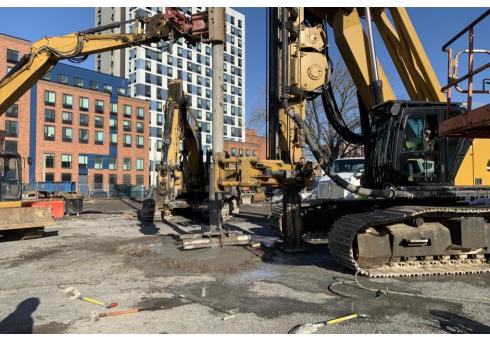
View of RYC Turbos Corp. installing a pile in the southern part of the site (facing northwest).
